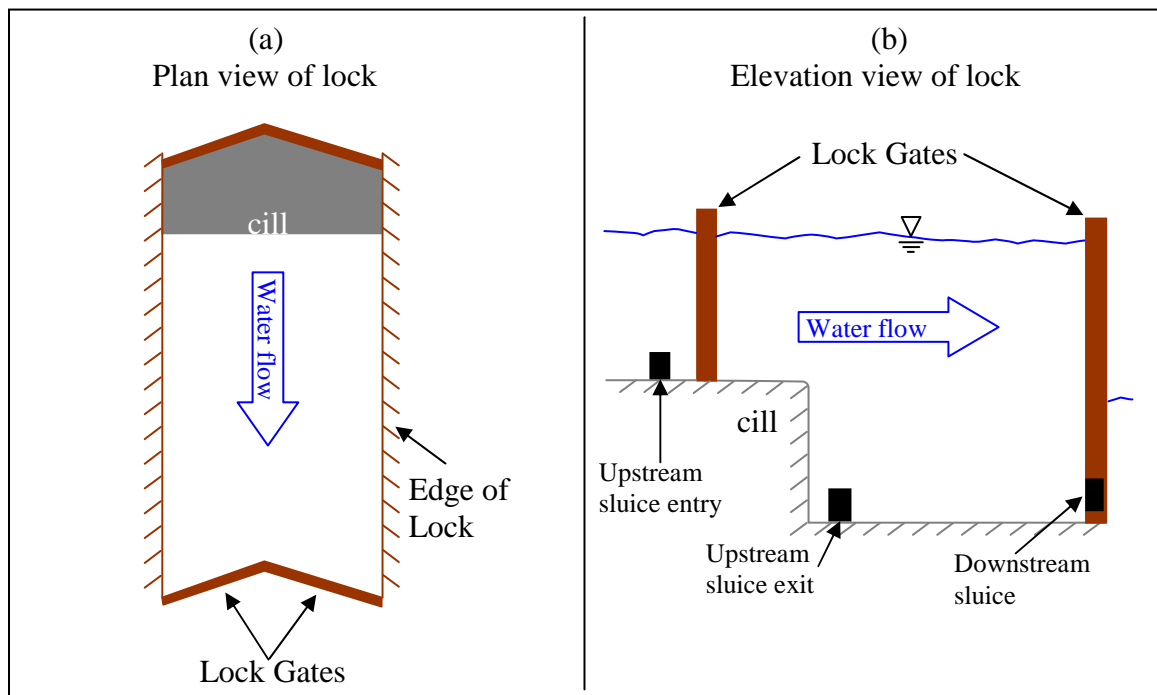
Plan (a) and elevation (b) views of a typical lock.
